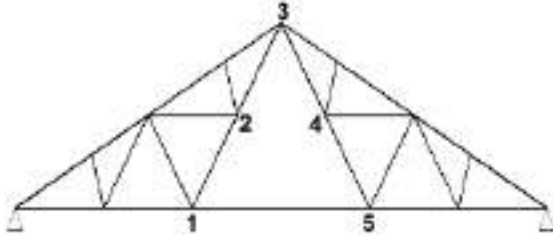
A Stable Planar Truss with a Non-Triangular Layout
